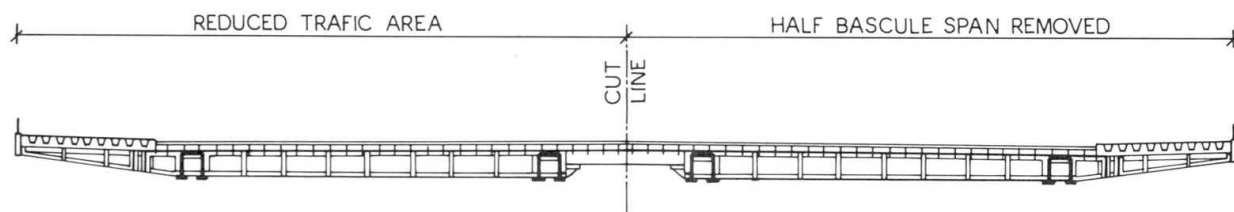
Knippels Bridge. Cross Section of Bascule Span.
